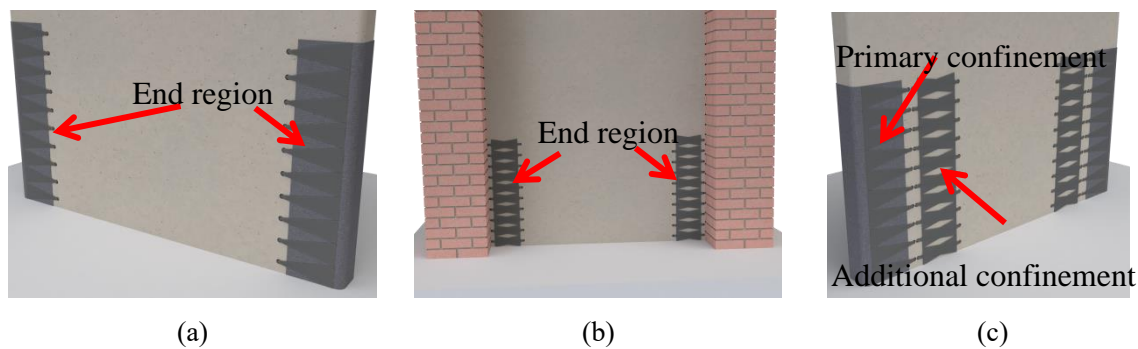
Wall strengthening with FRP -confinement: (a) Laminate and spike anchors; (b) Only spike anchors; (c) Multiple confinements
